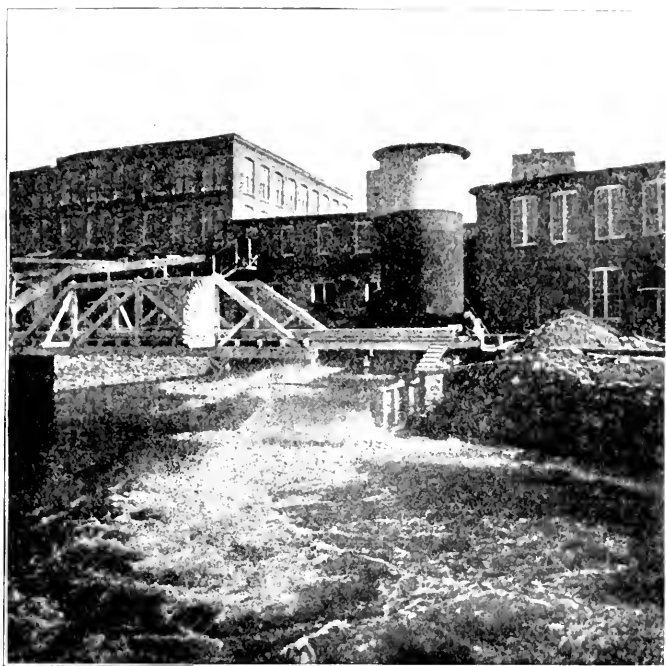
MAGOG. COMPRESSOR HEAD AND WEIR. THE AIR COMPRESSOR IS BLOWING OFF.
